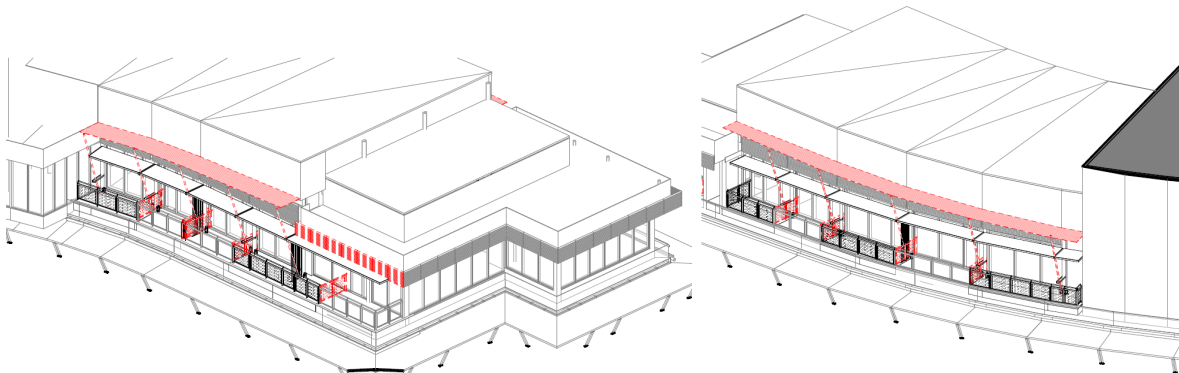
| Isometric diagram of proposed balcony 1 (left) and 3 (right) (Source: Architectural Plans)
